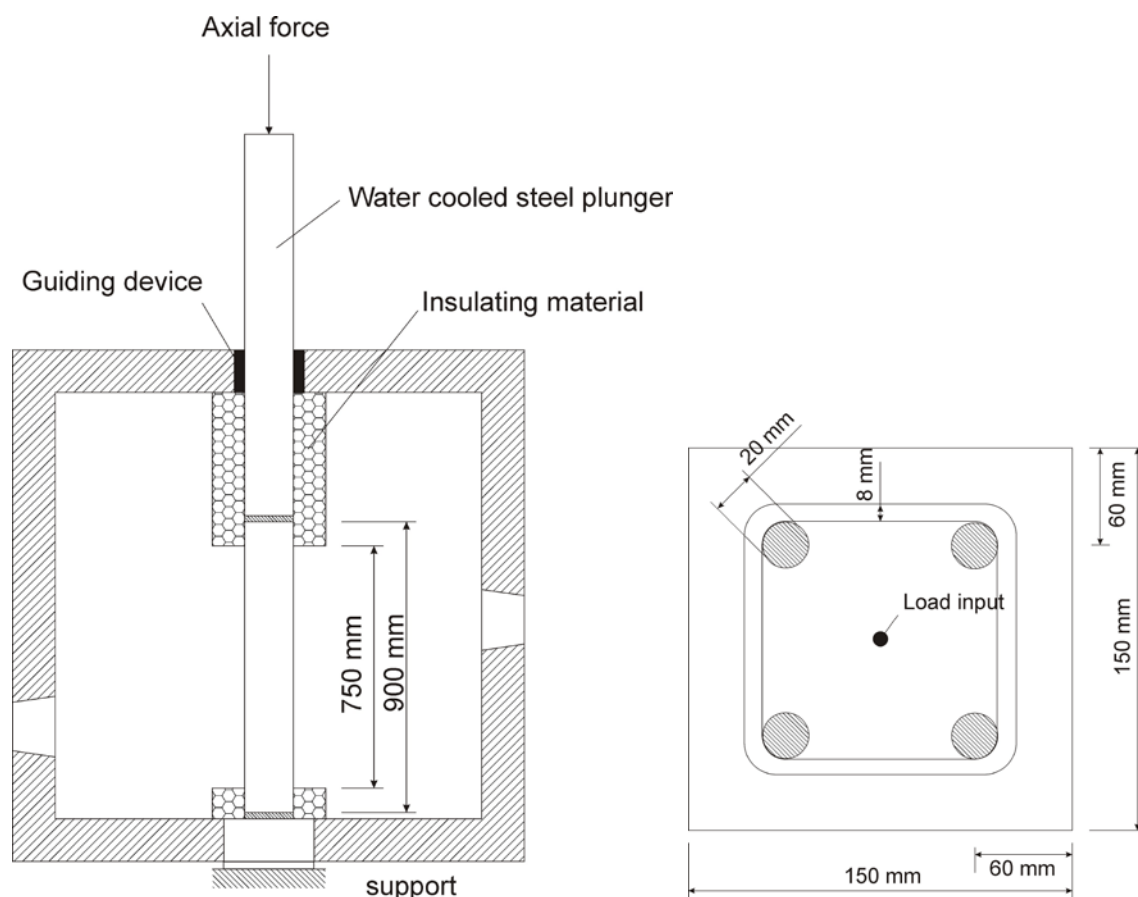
Principle sketch of test equipment and cross section of specimens
